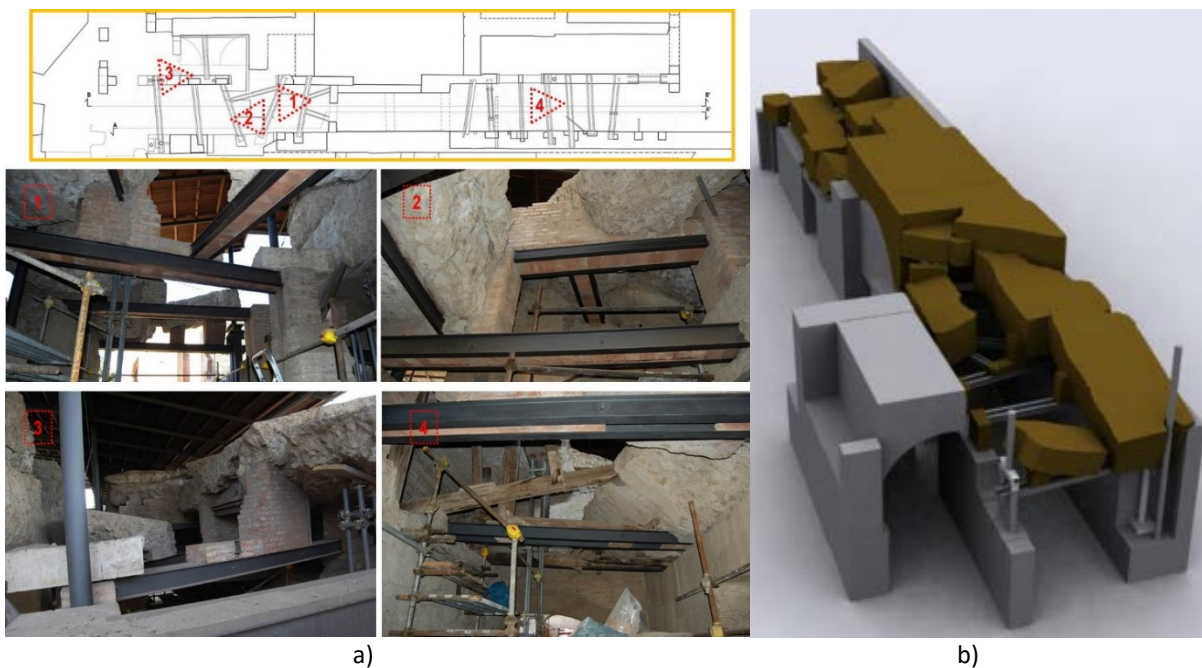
Previous retrofit intervention (XX century): a) plan view with optical cones of images, details of the steel beams, squat brick walls and wooden struts, and b) rendering.
